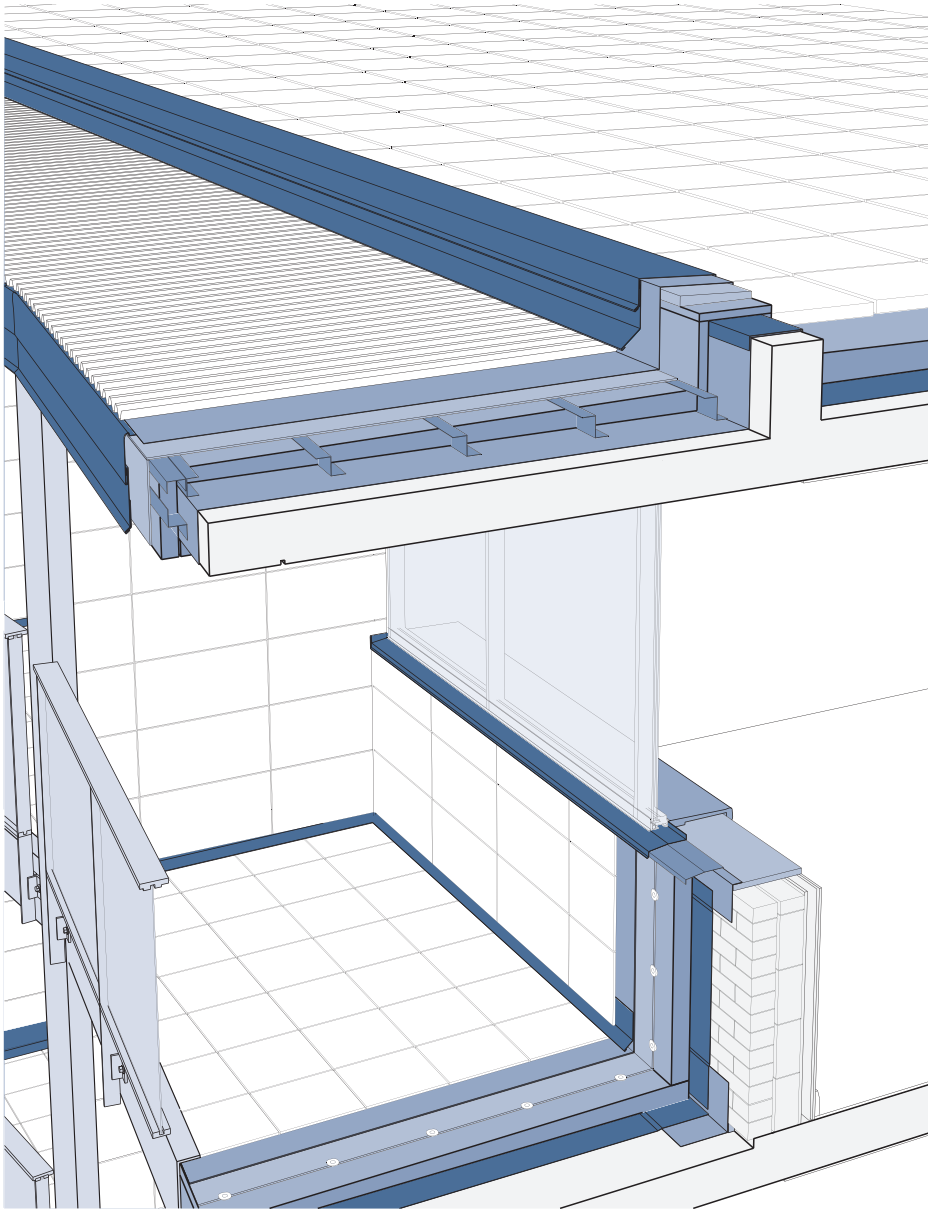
The corrugated metal roofing is installed over the projection roof area, followed by the parapet flashing which completes the roofing replacement sequence.
